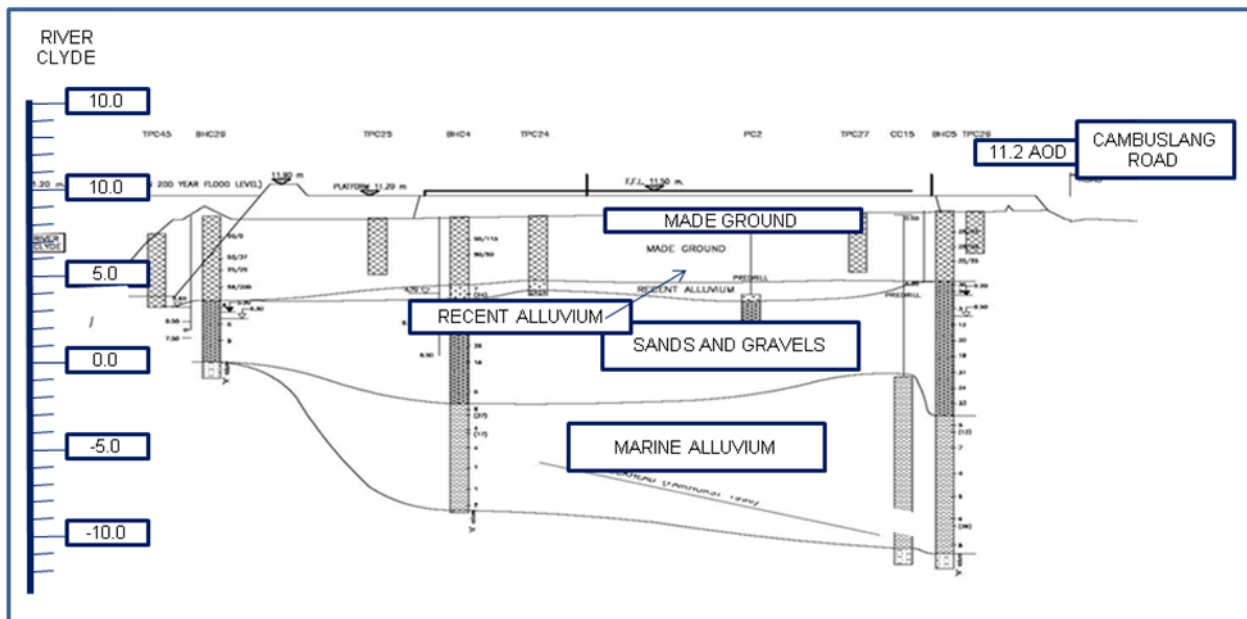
Adapted from Swanson and Clow, Cambuslang Investment Park - Construction on Clyde Alluvium Earthworks - Imported Fill (unpublished draft paper, 2008)
